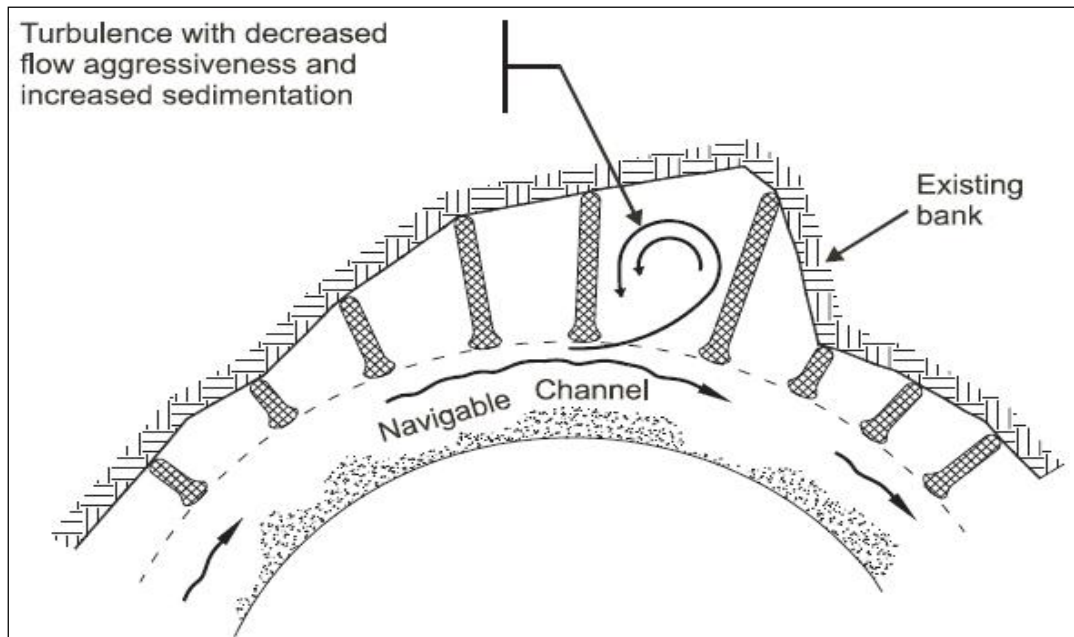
Plan view of system of spur-dikes constructed to control and stabilize the erosion of the outer bank
